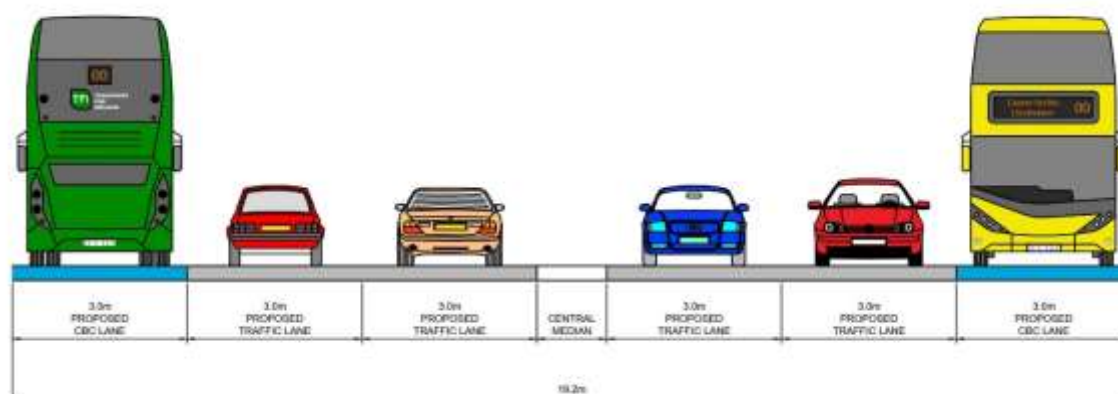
Typical National Primary Road Cross Section (A-A), (B-B)
